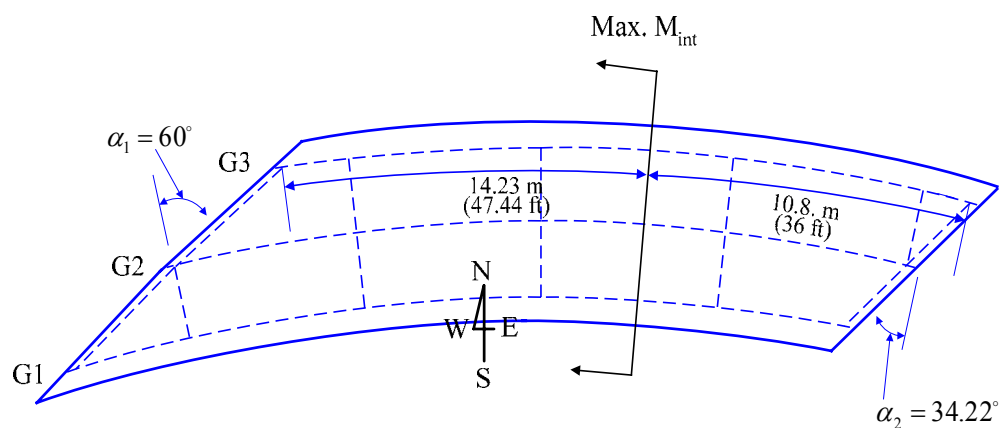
Plan view of the Case 6 composite bridge (maximum skew angle of 60 degrees) showing the location of the maximum FEA internal moment for both on G3 as well as for the total bridge cross-section.
